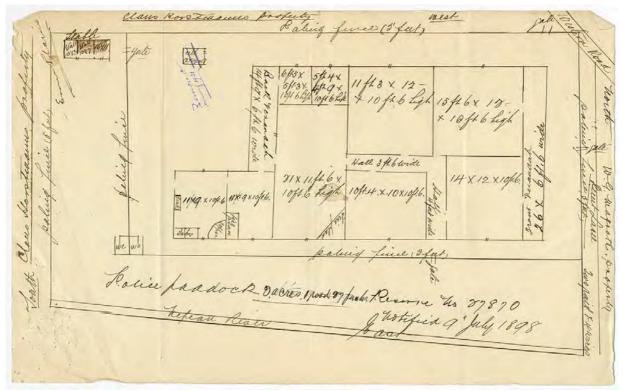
32: Undated sketch plan of the new Police Station and Residence, constructed in 1908 showing configuration of the site including surrounding paling fences, the privy, stables and portable cell (noted as having been removed in 1921). Source: SLM/Caroline Simpson Library, 54161
